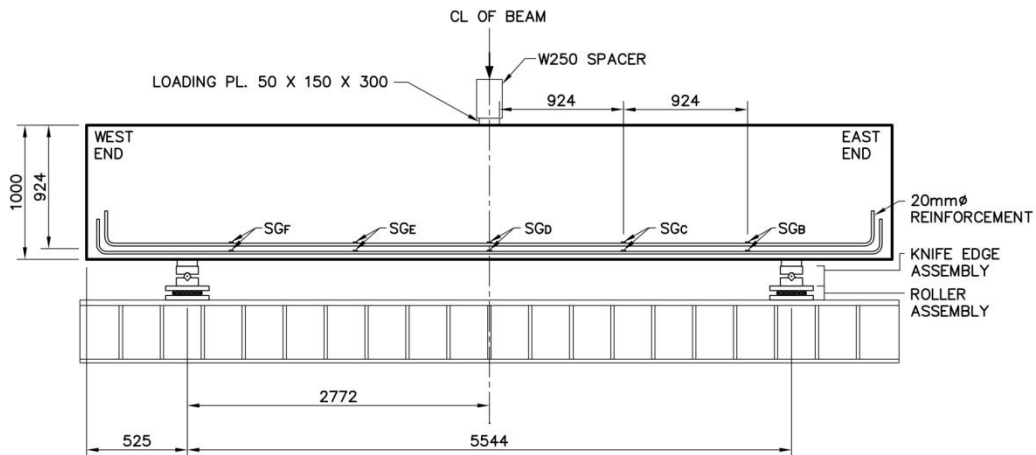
Specimen S1000-B1 Test Setup and Configuration
